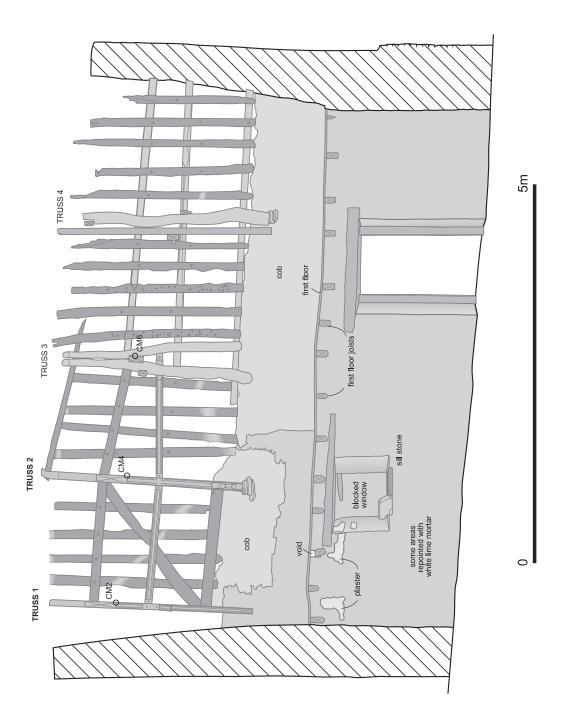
The chapel at Lower Alsworthy, interior elevation of south wall (scale 1:50 @A4). Carpenter's Marks (CMn) as shown in Fig. 11; original truss blades labelled in bold. Surviving  $15^{\text{th}}$  century roof timbers depicted in a darker tone.
